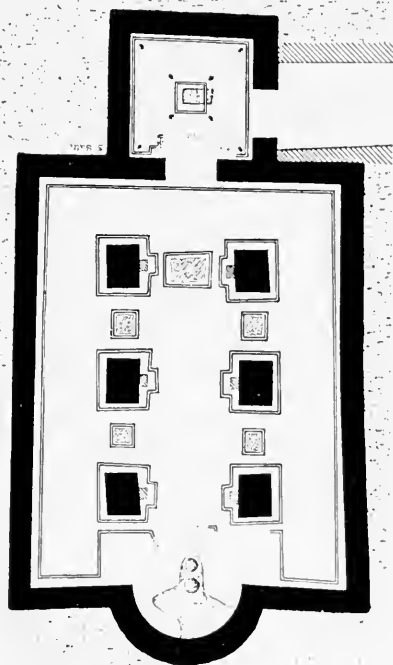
Plan of the underground temple near the Porta Maggiore, Rome.
